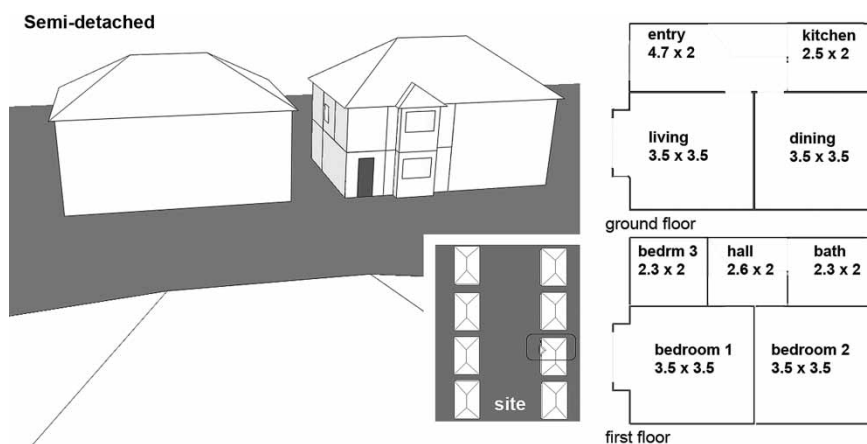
Perspective image, site plan and floor plans of the social housing suburb (SHS) semi-detached home. Source: adapted from Allen & Pinney (1990)
